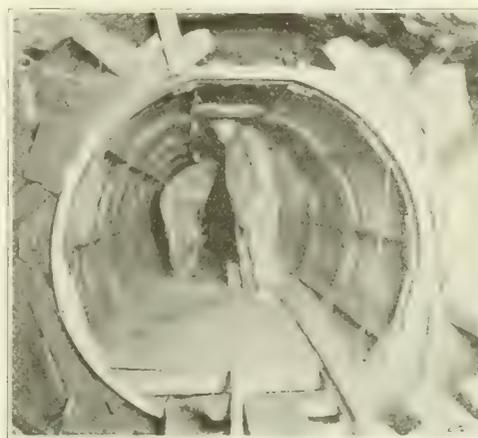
View of Concrete Forms for Lining Waban Hill Water Tunnel.
